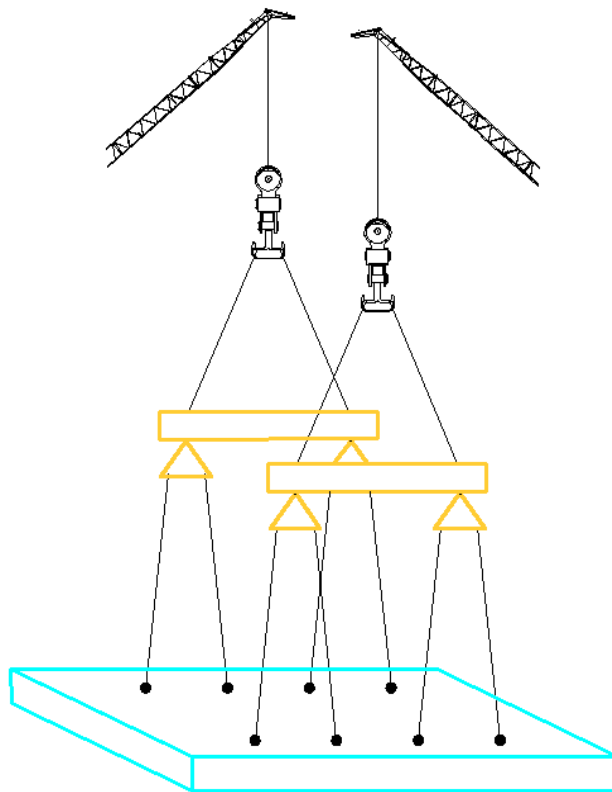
Two Crane Eight Sling Spread Rigging Arrangement
